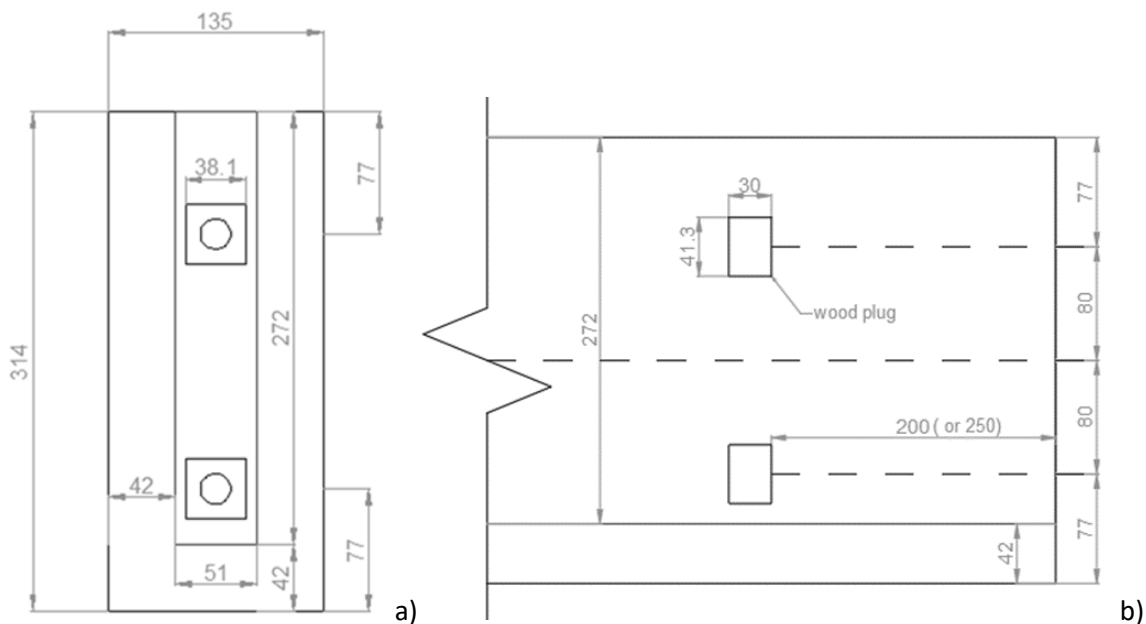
a) Beam-to-column connection's cross section; b) Beam-to-column connection's side view
